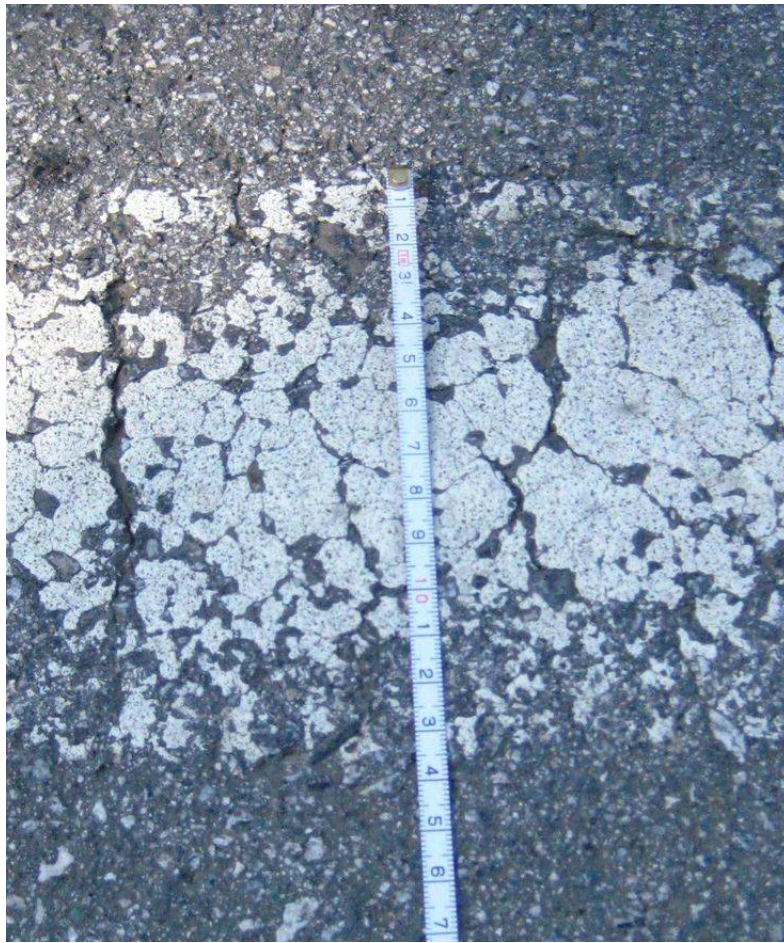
A third measurement taken near the intersection of Old La Honda road and Portola Valley Road. Again the stripe width is 14 cm. Photo taken 26 Mar 2008.
